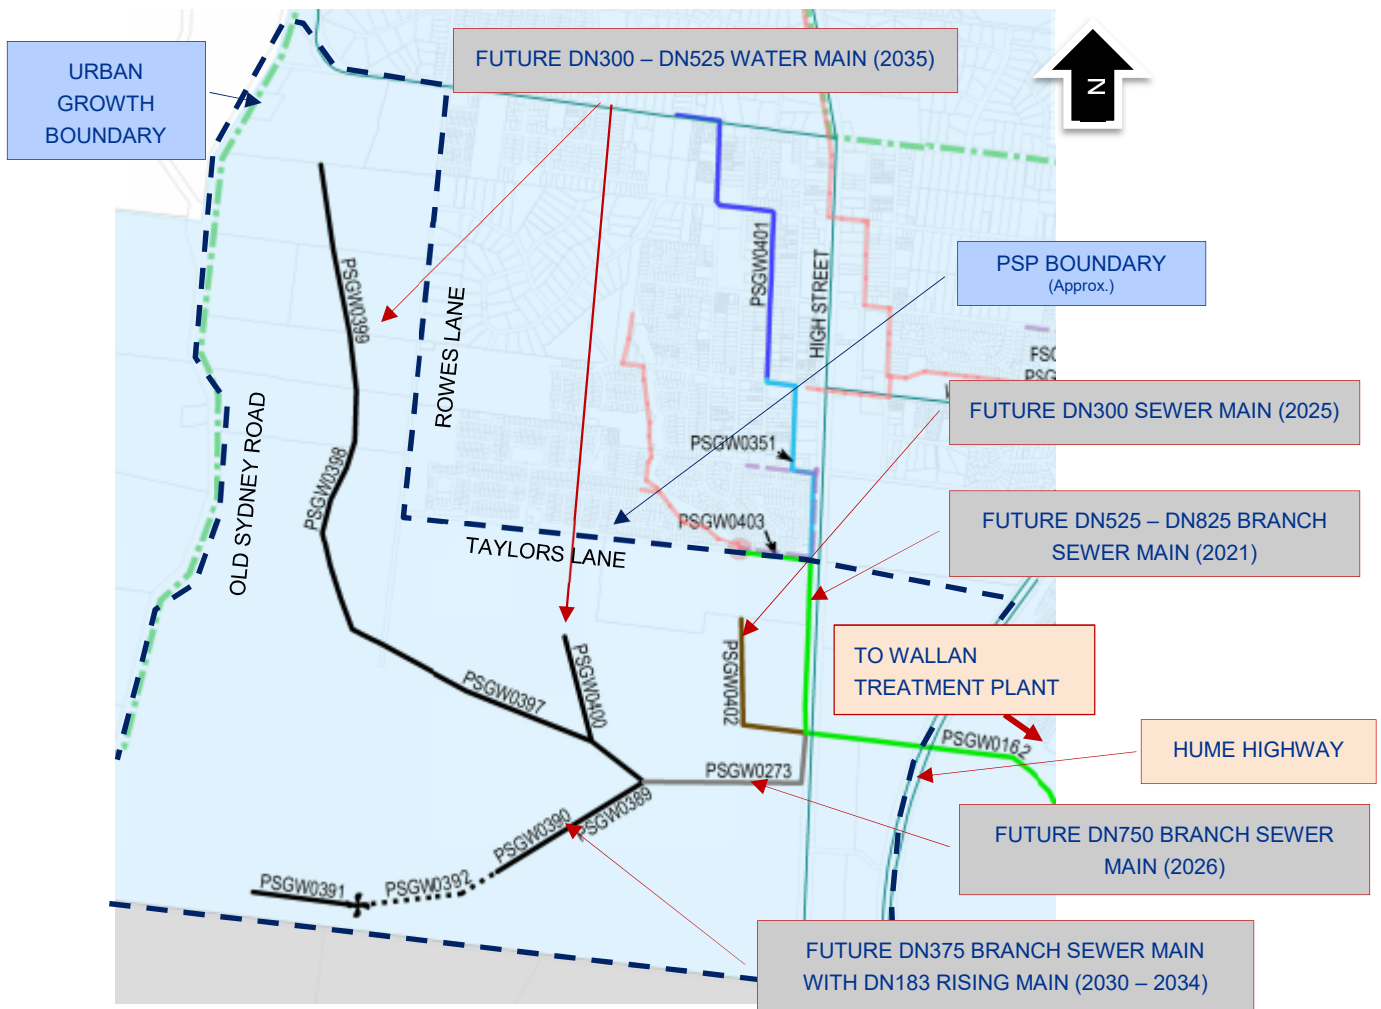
YVW Beveridge Wallan Planned Sewer Assets - Refer Appendix A.2.3 (Not To Scale)
